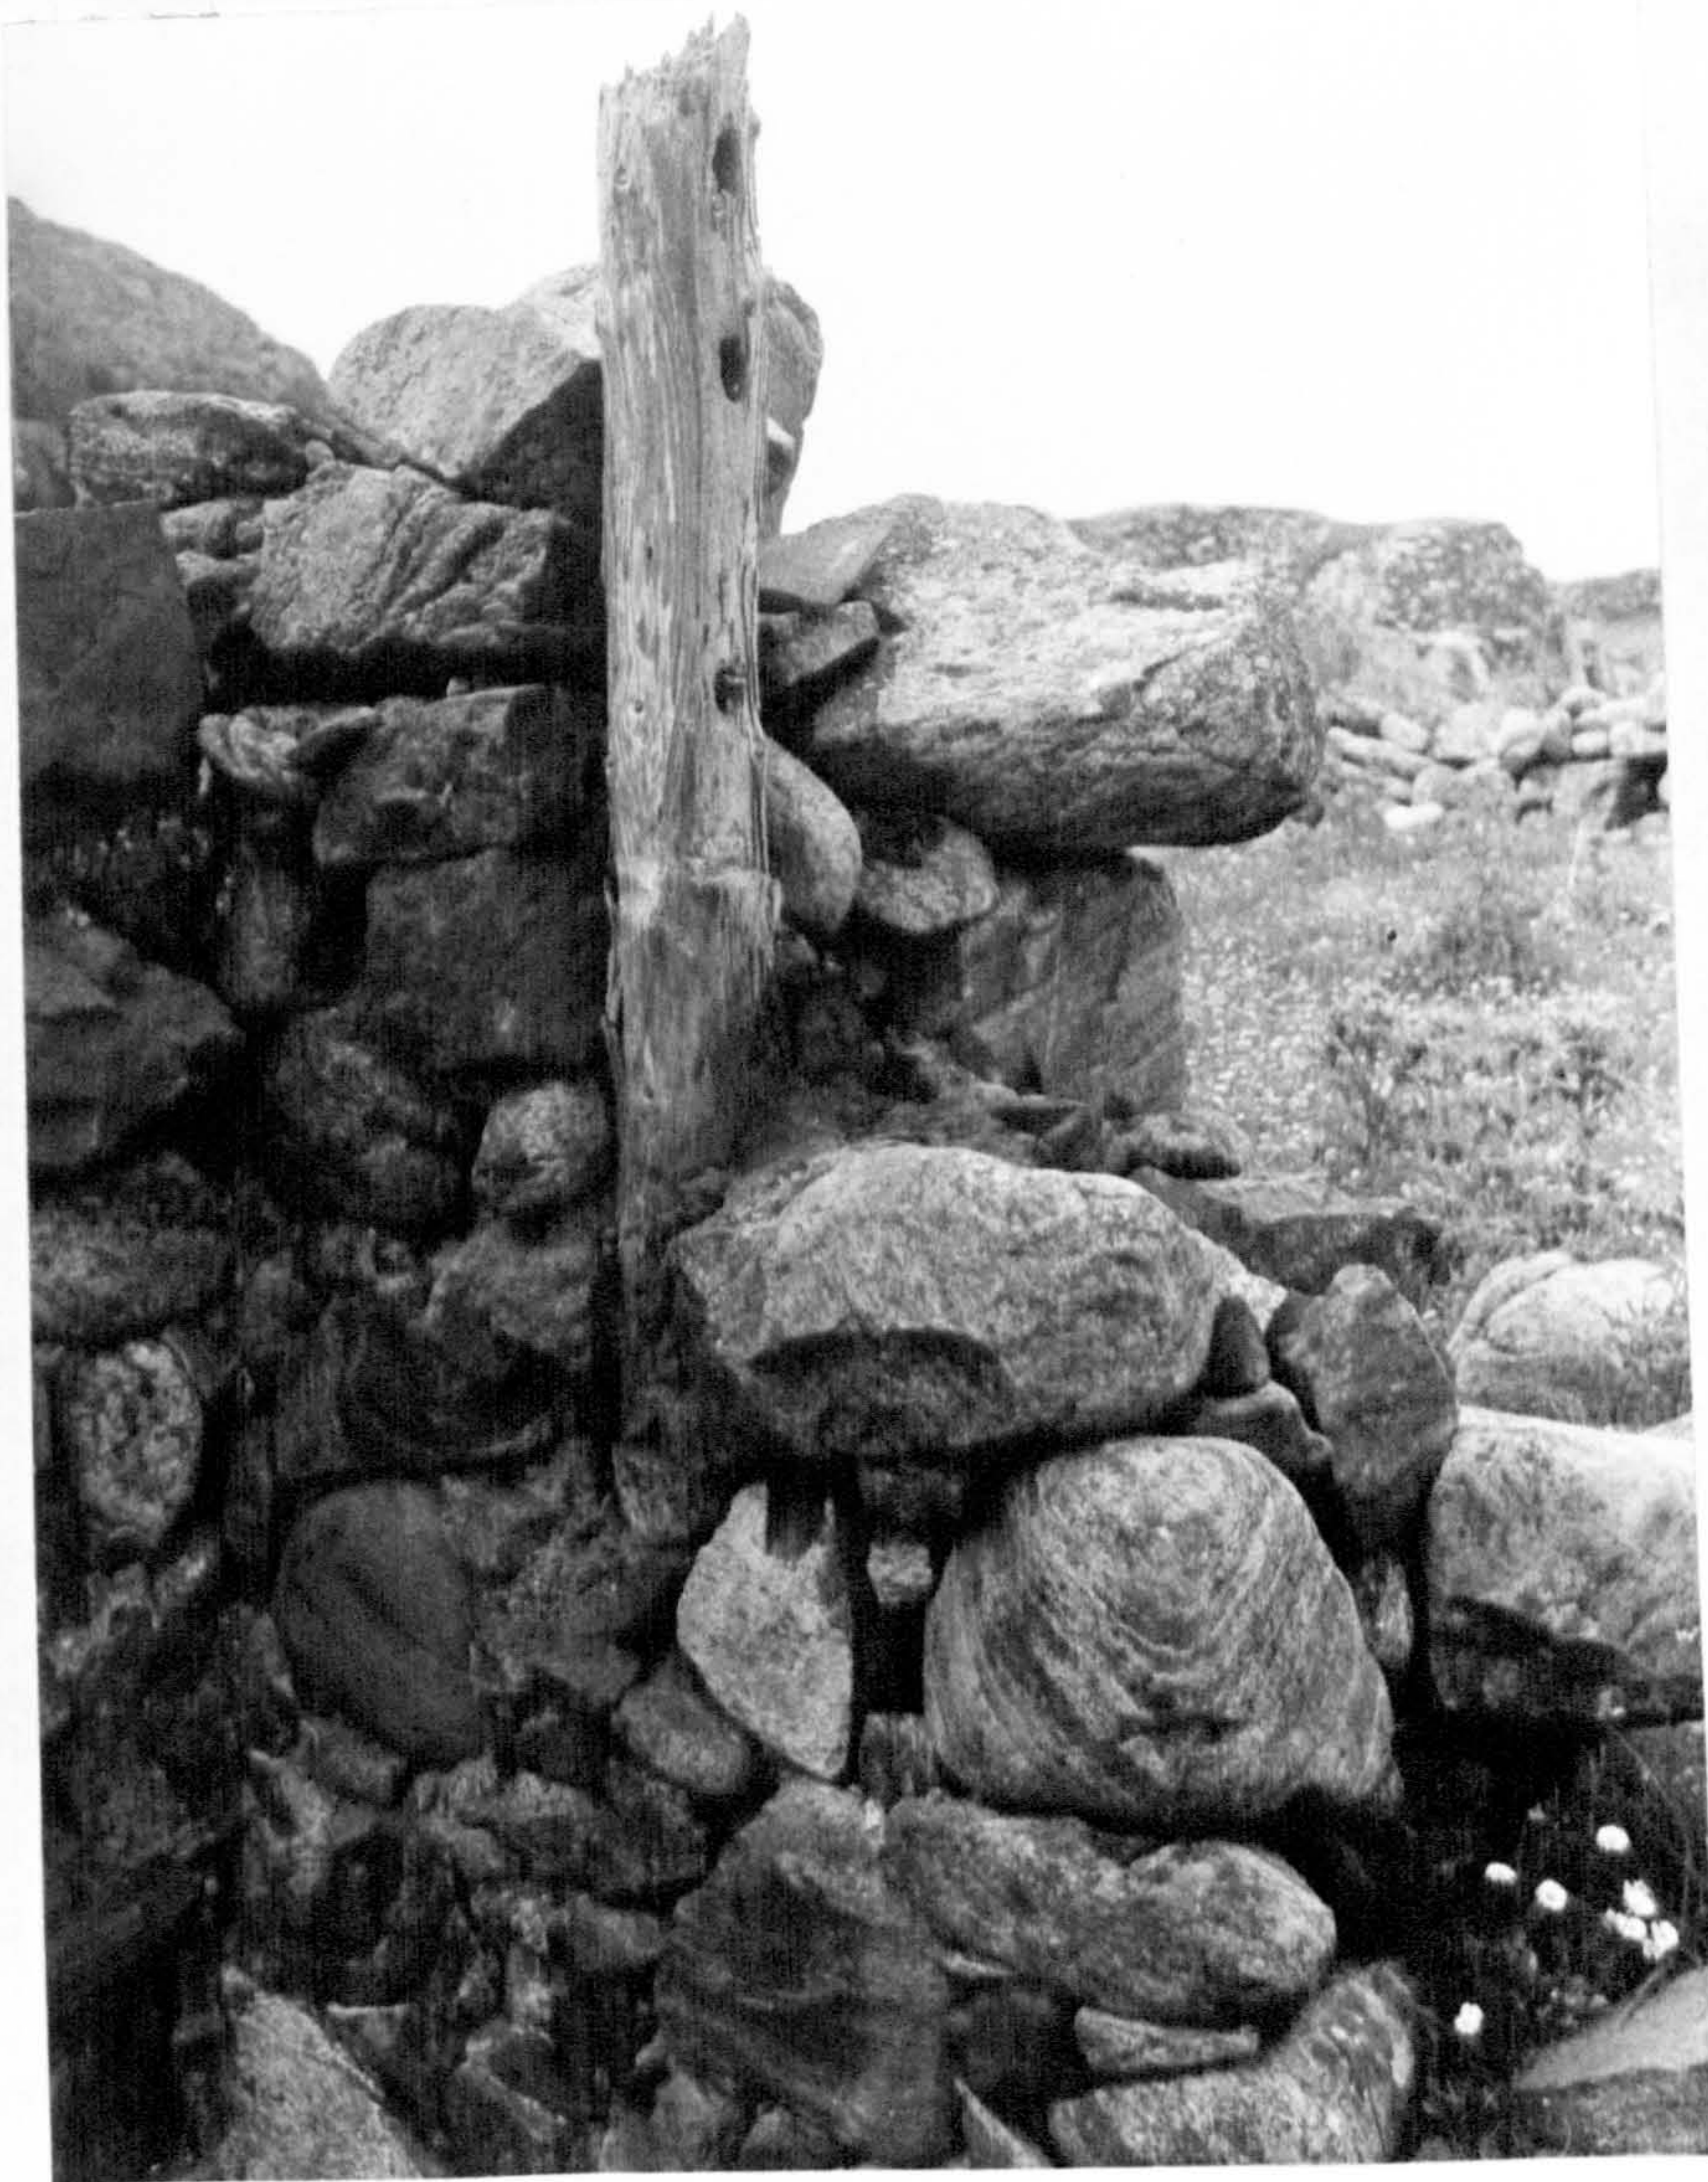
Remains of cruck high in wall of building at X on Auchmelvich.
